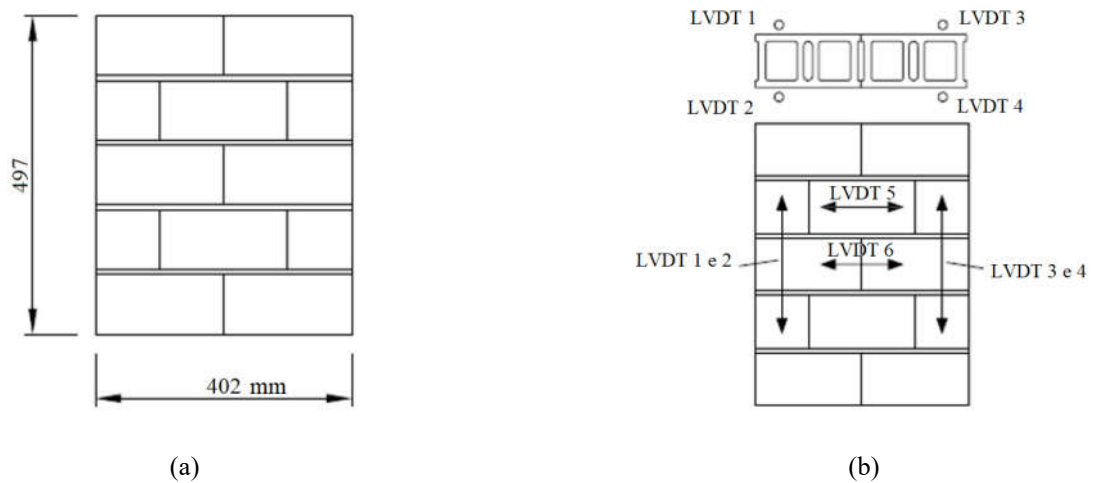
Wall specimens: (a) Dimensions (in mm); (b) Instrumentation [7]
